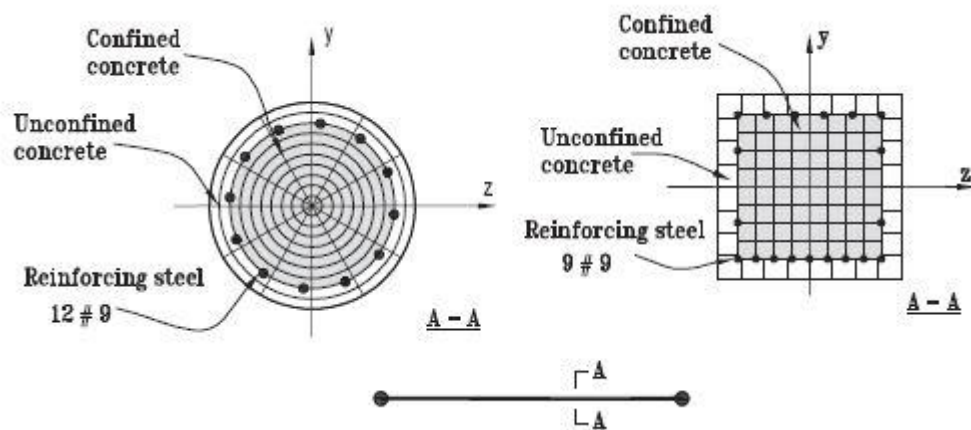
Nonlinear beam-column element with fiber section [45]
